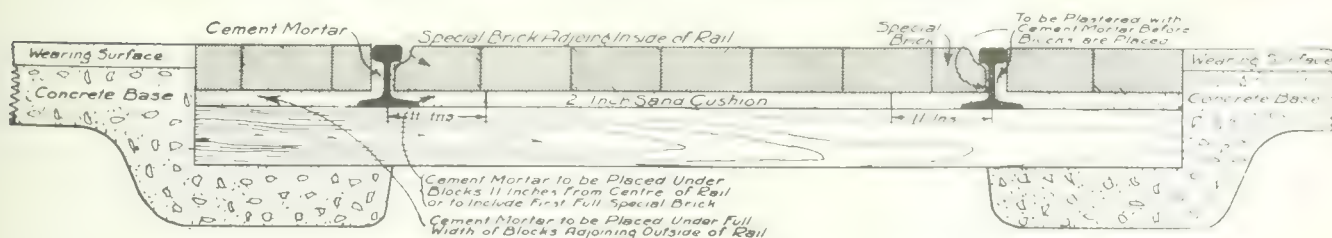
Detail of Rail Section for Vitrified Brick or Scoria Block Pavements.
